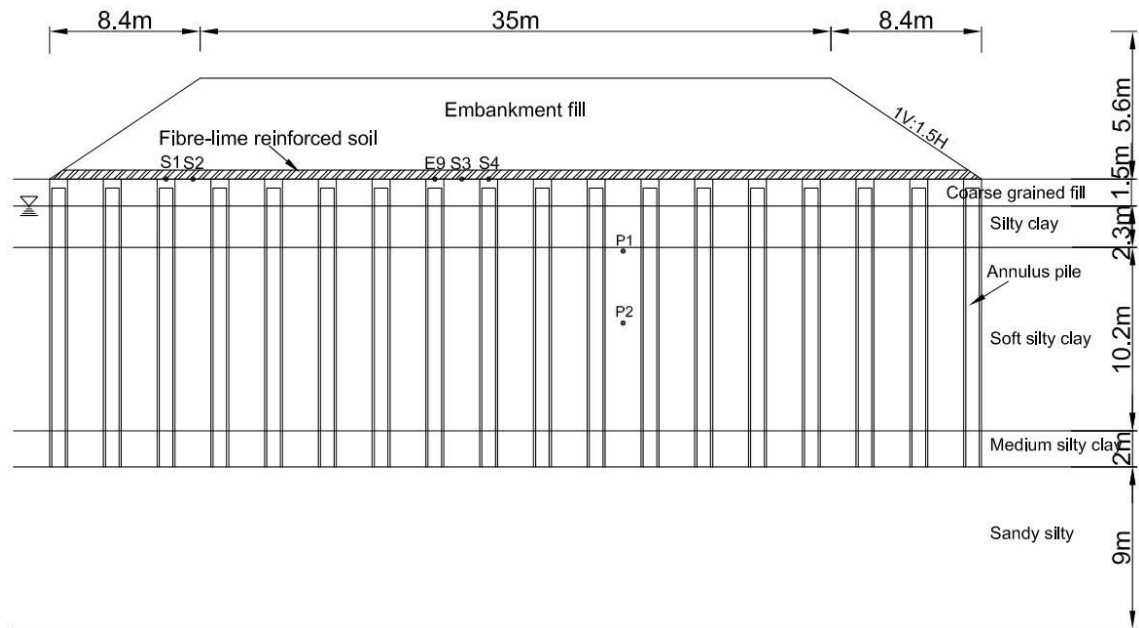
Cross-section of the FRLTP and piles supported embankment (case study 3)
